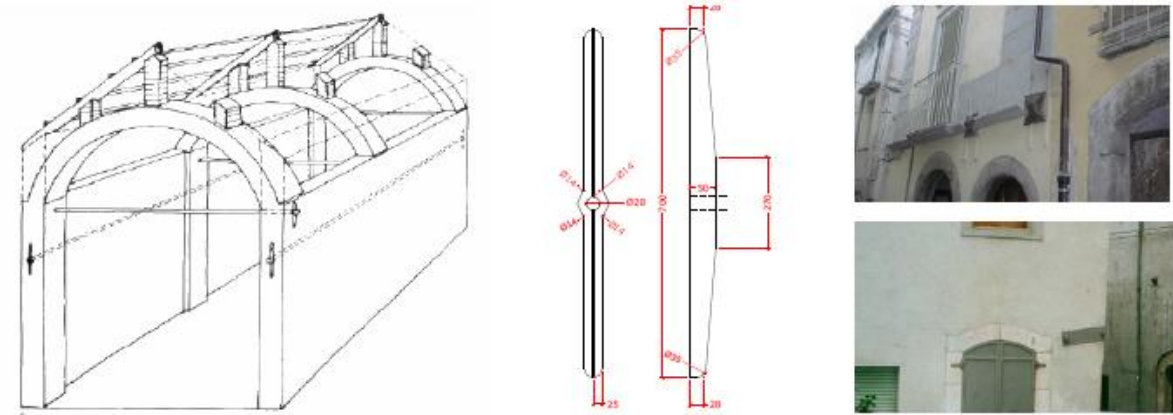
Improvement of structural connection: a) Metallic tie-rods along the two main direction of the structure, b) details of rosehead washer bearing bolt, c) examples of rosehead washer bearing plate
